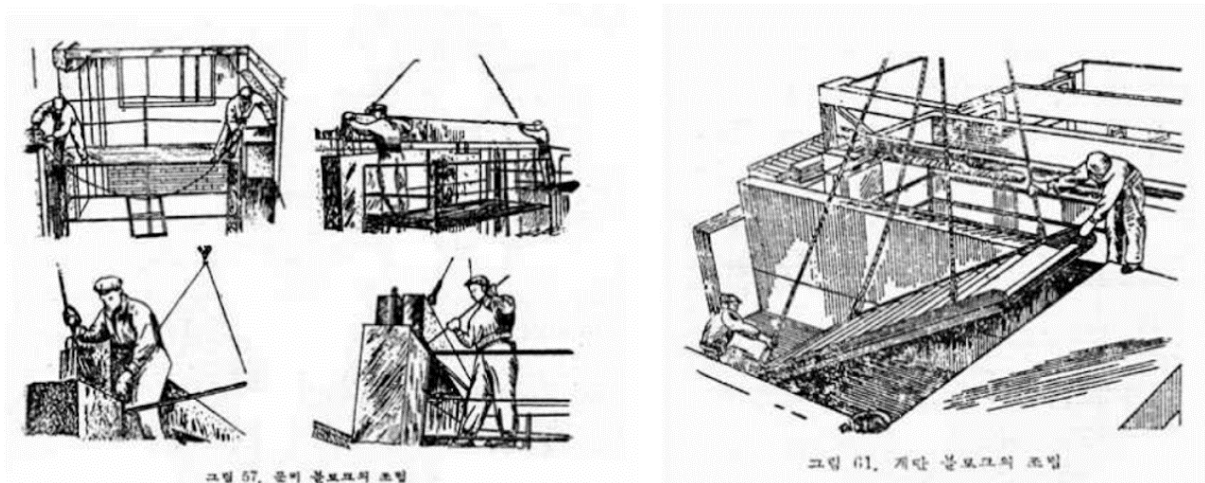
Brick Block Masonry Construction<sup>228</sup>
